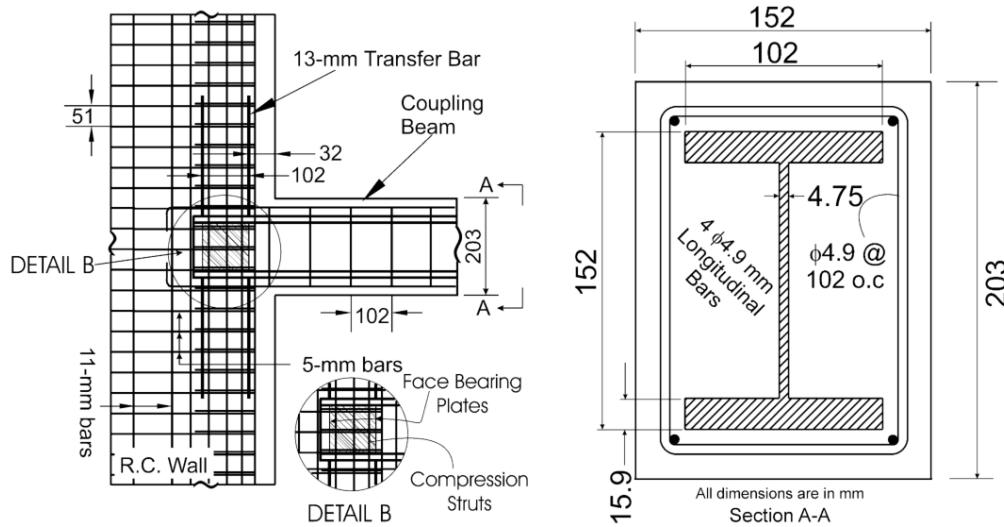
Steel bracket to supporting concrete element connection
